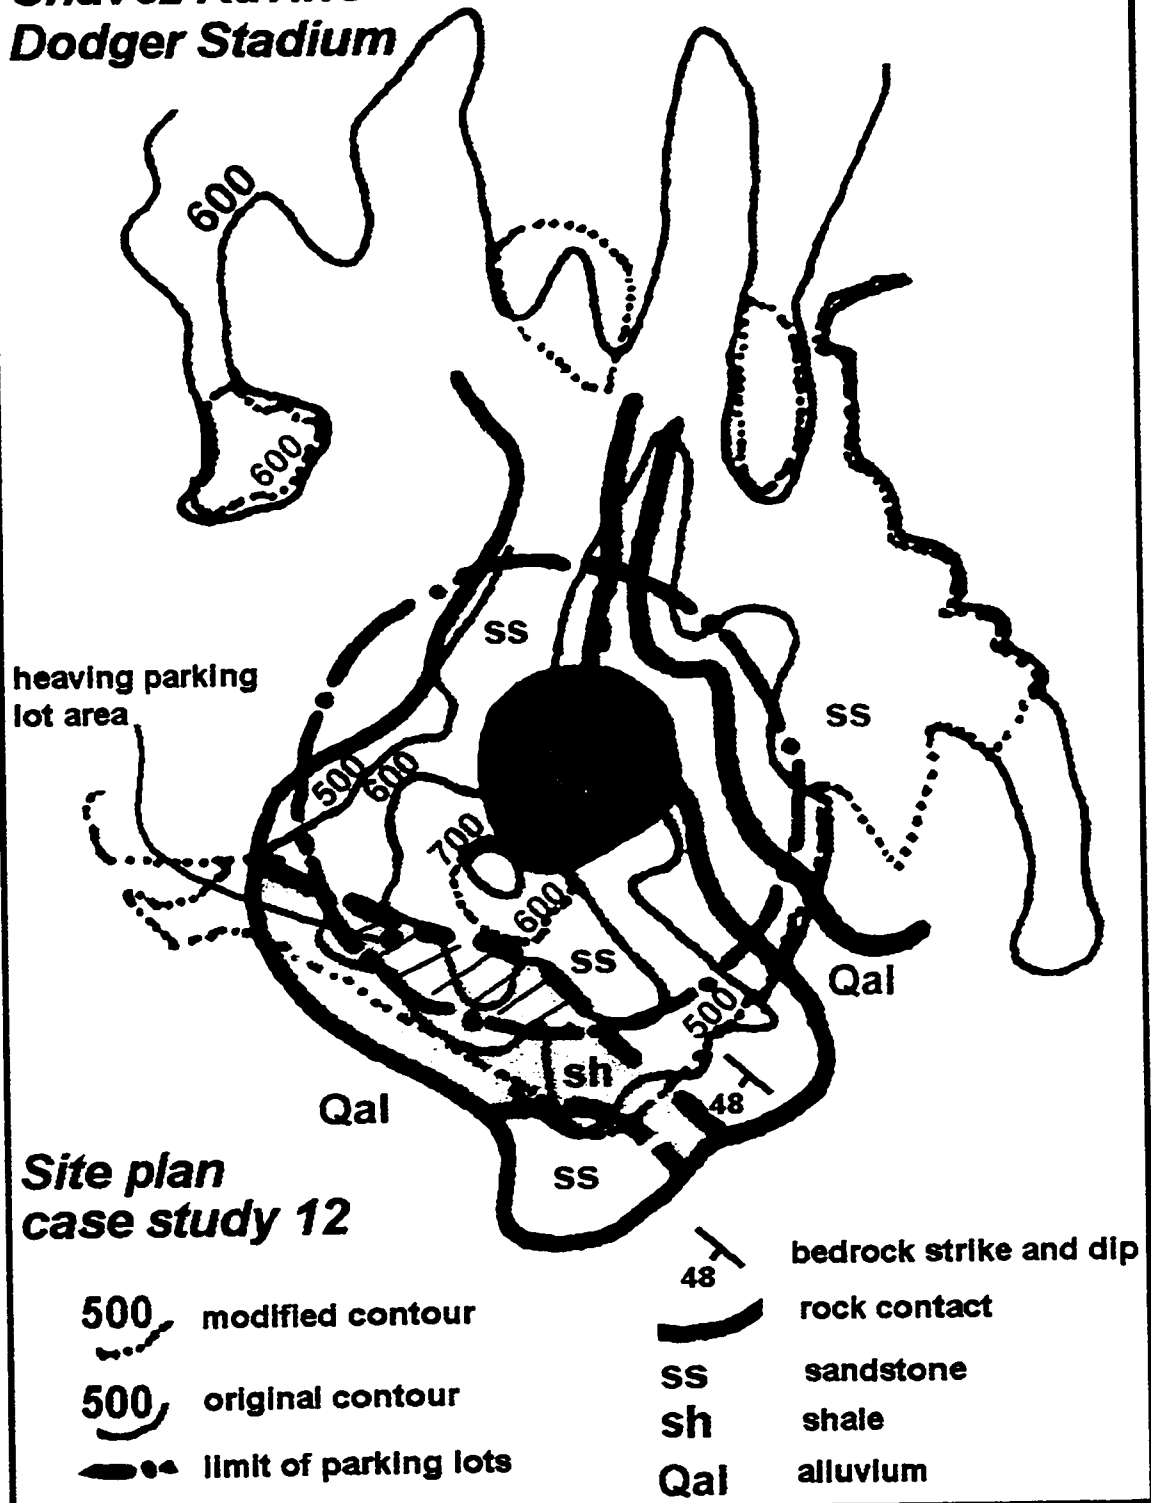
Site plan case study 12. Hachured area shows where parking lot heave occurred.
